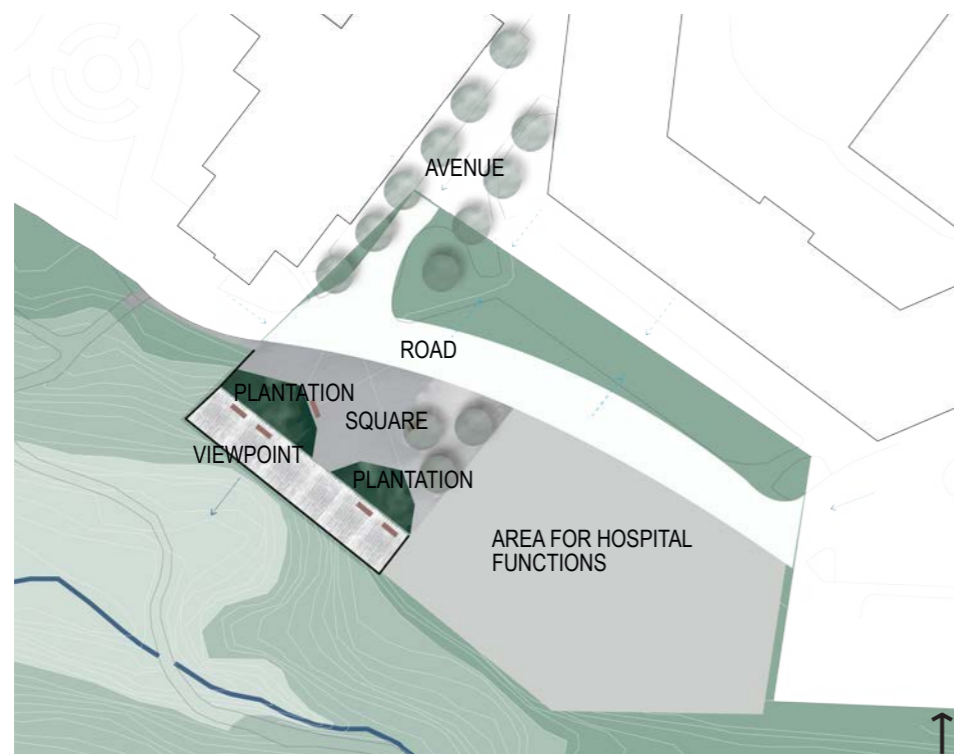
FIGURE VII. ILLUSTRATION PLAN OF DETENTION STORAGE AREA 4 - VITSIPPSDALEN.
